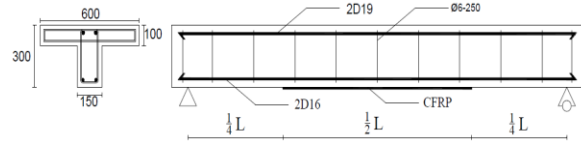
Beam reinforced half of the span Mulyanto (2020)
